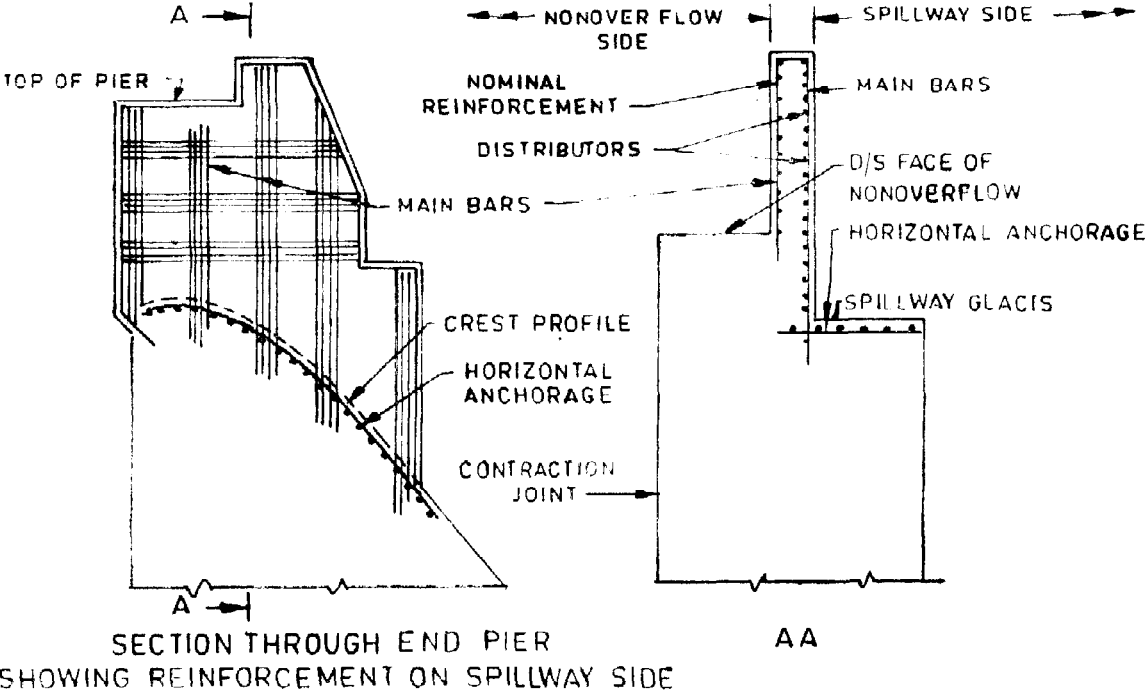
TYPICAL REINFORCEMENT DETAILS FOR END PIERS
